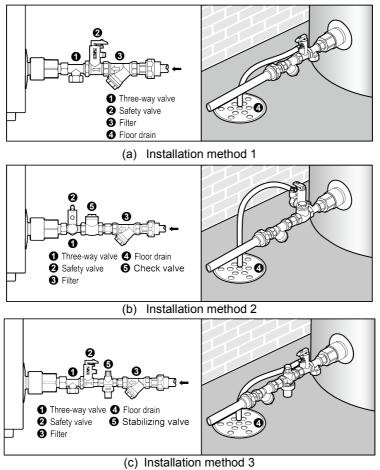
Safety valve installation diagram of cold water inlet pipe
